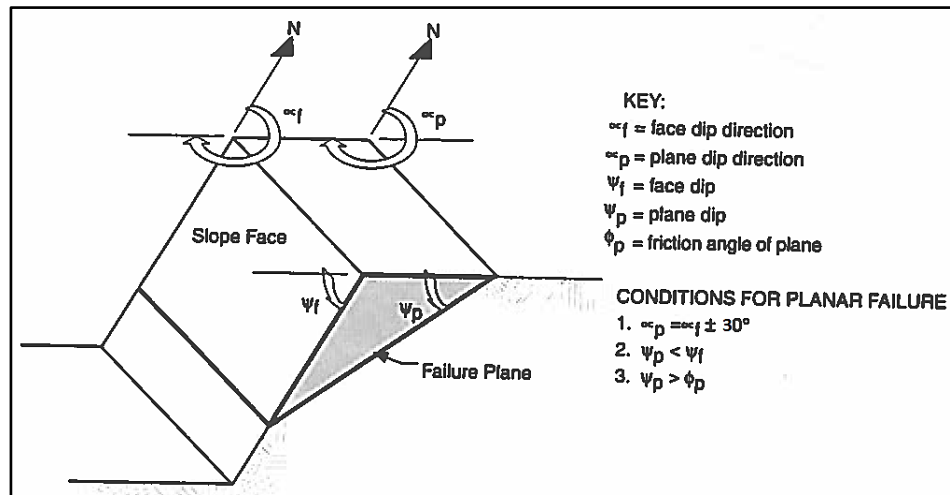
Diagram Detailing Conditions for Planar Failure
